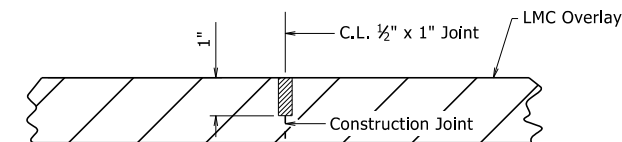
DETAILS OF HYDRODEMOLITION AND LATEX MODIFIED CONCRETE OVERLAY
